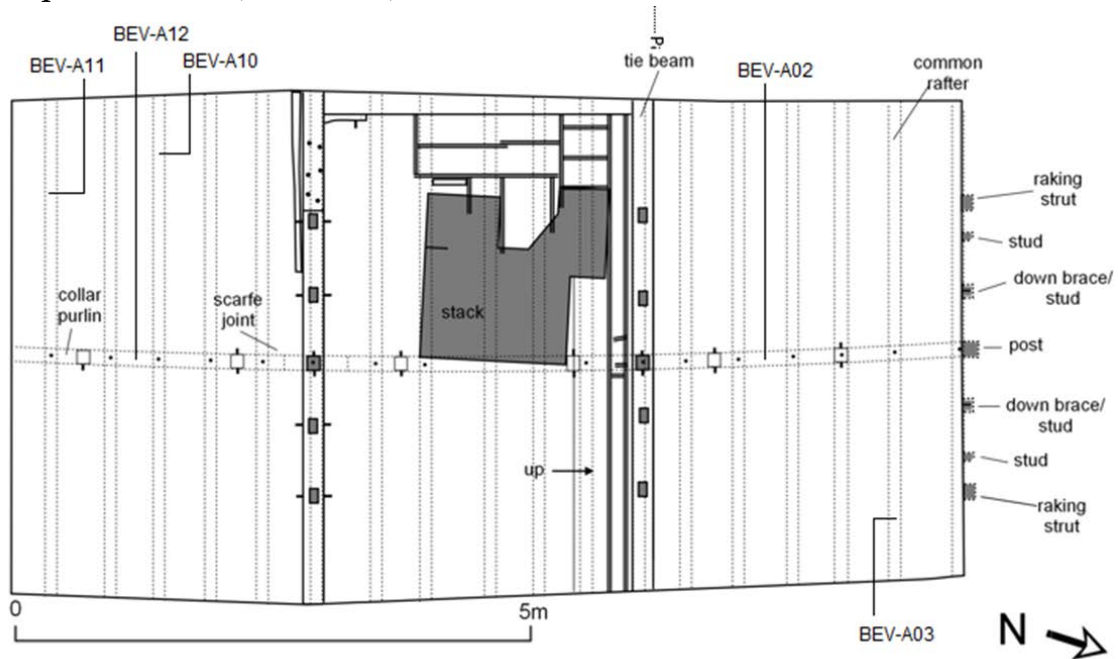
Roof plan, showing the location of samples BEV-A02, BEV-A03, and BEV-A10-12 (YVBSG 2016)
